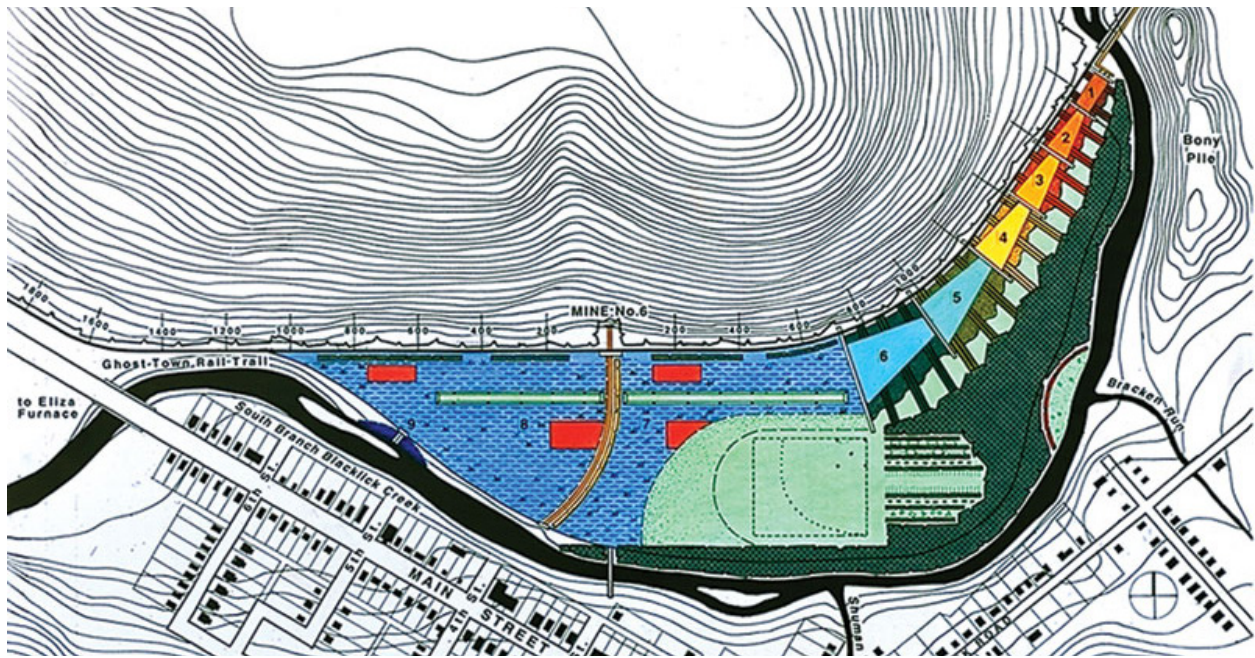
Site Plan and Image of Vintondale Reclamation Park
